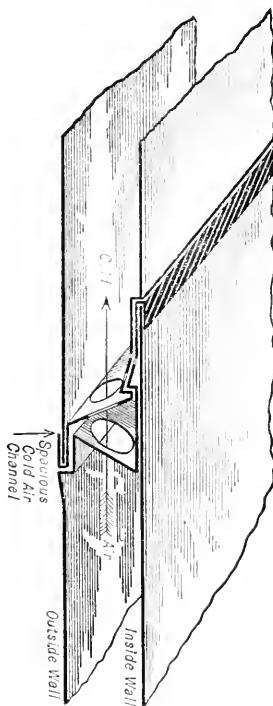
LOCKING JOINT FOR DOUBLE WALL PIPE.
